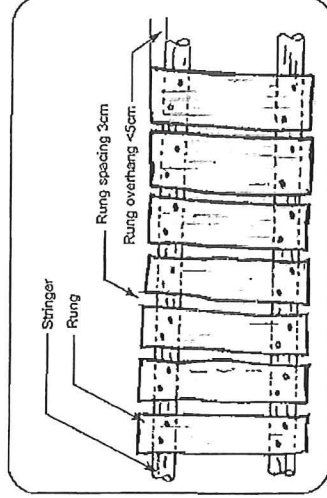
BRIDGE RUNG SPACING, RUNG OVERHANG
